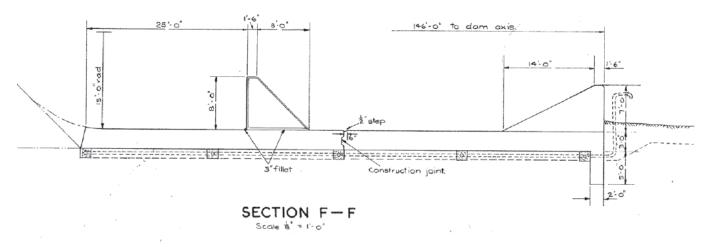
Cross-section of stilling basin showing sub-surface drainage
